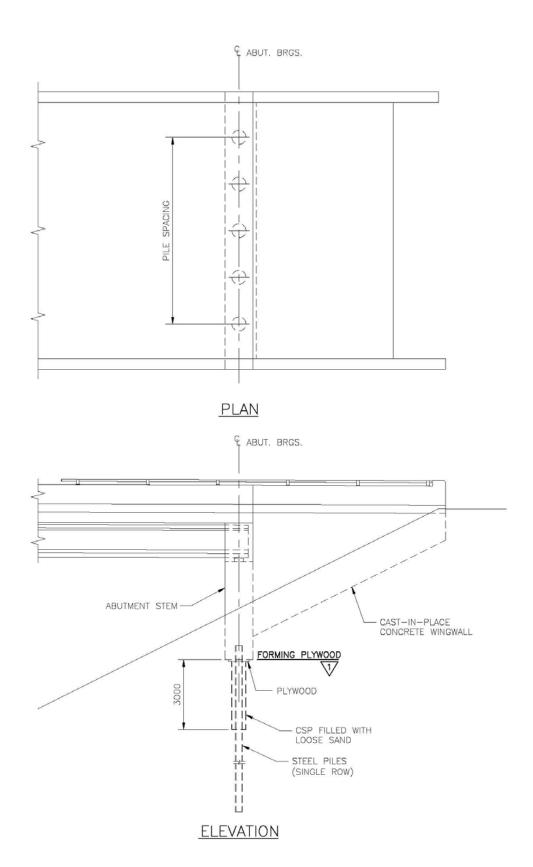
Cast-in-Place Abutment and Wingwalls – For Section 1 ("FORMING PLYWOOD"), see Figure 5.5.
